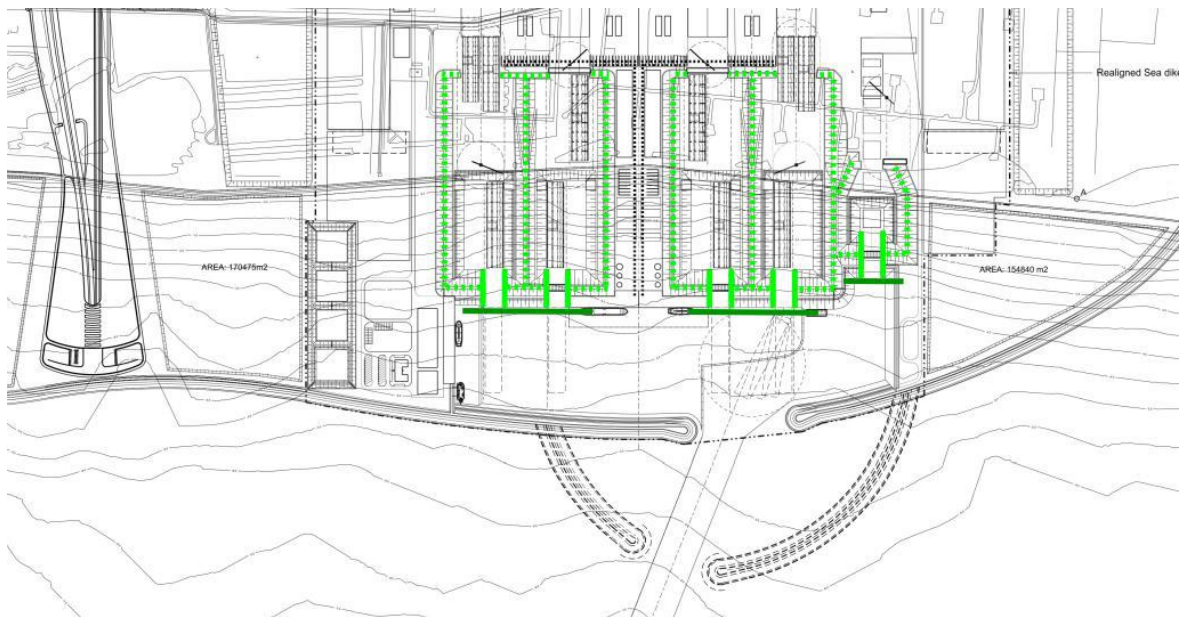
Piling from land, sheet piles (Rambøll, 2011).
